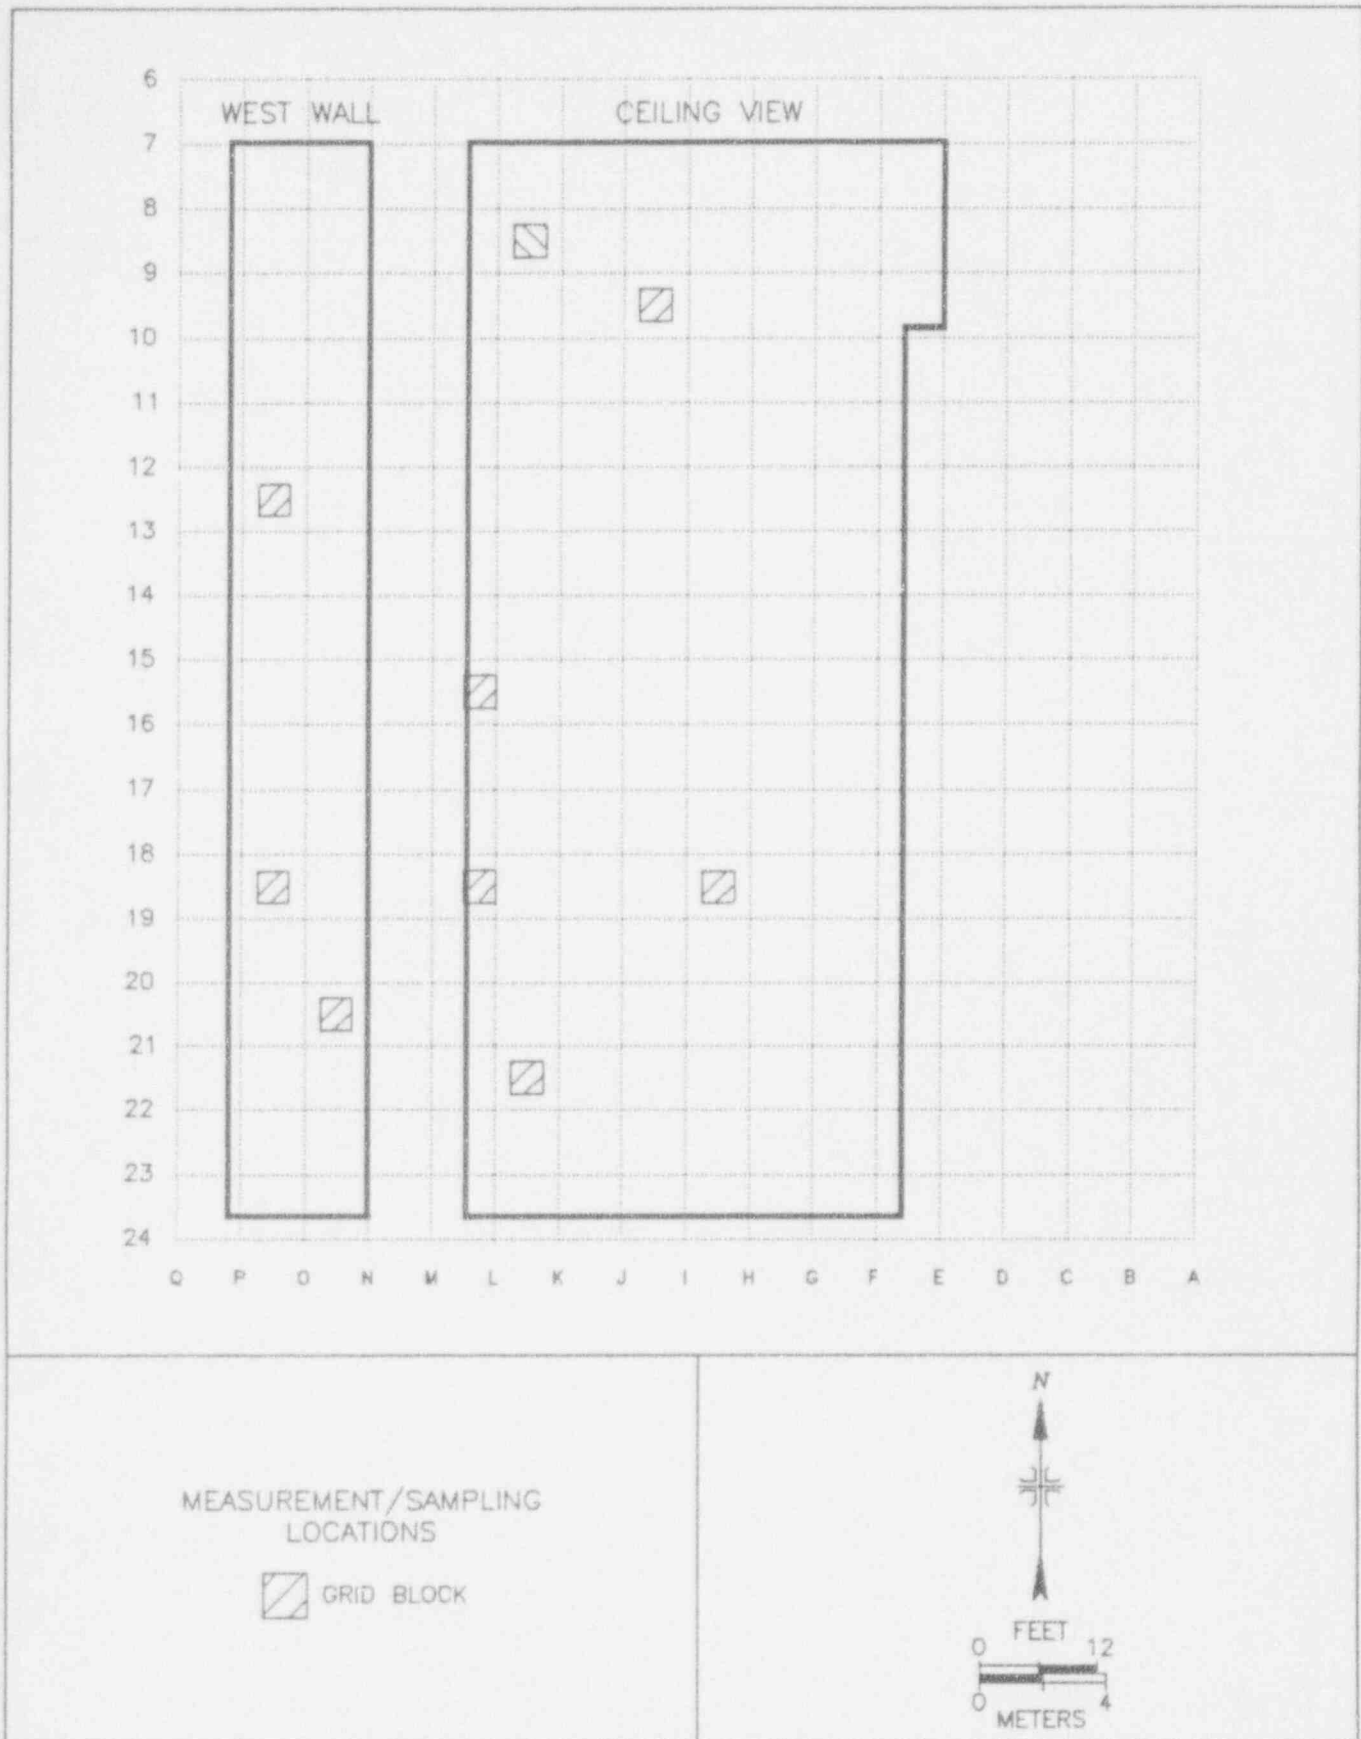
Unit 1, Upper Wall and Ceiling – Measurement and Sampling Locations
